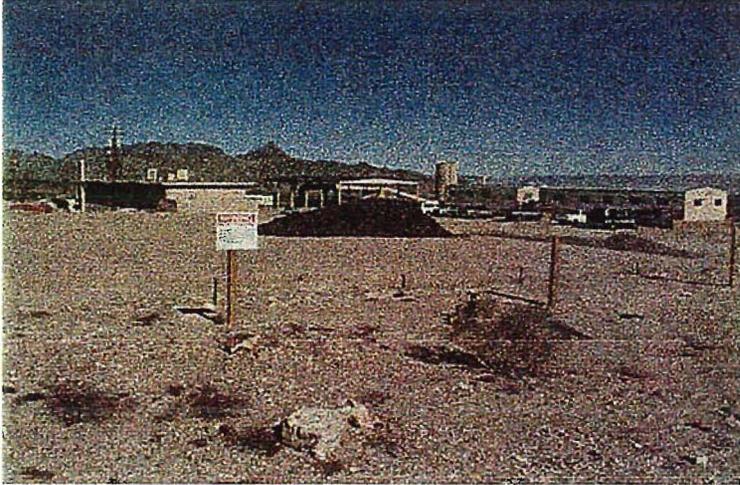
Taken looking northeast at the Phoenix R. & D. #VIII. Shows coarse cinder stockpile, center foreground. Temporary Security & Quarters and processing area and testing facility in background. Tortoise fence in foreground behind sign. Taken by J. Mur 12/16/98.
